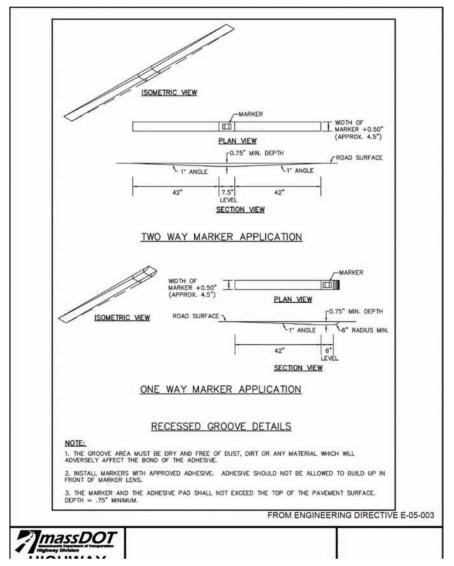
Construction detail—groove for slotted pavement marker on asphalt pavement (personal communication, B. Lang, MassDOT, May 29, 2020).
